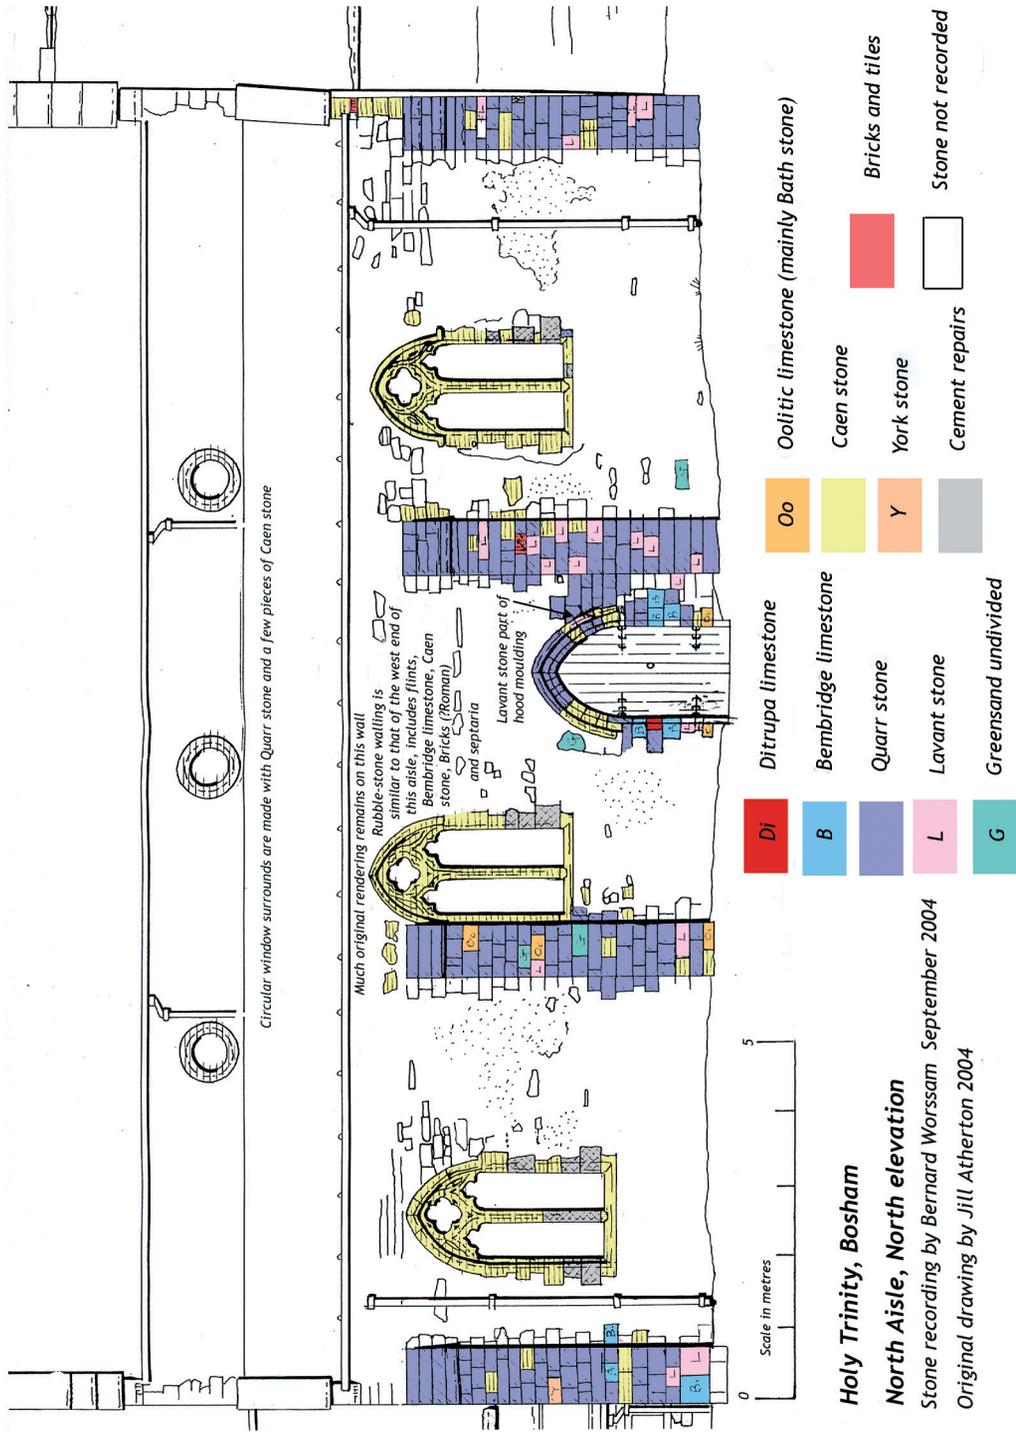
Holy Trinity Church, Bosham — nave aisle, north elevation.
